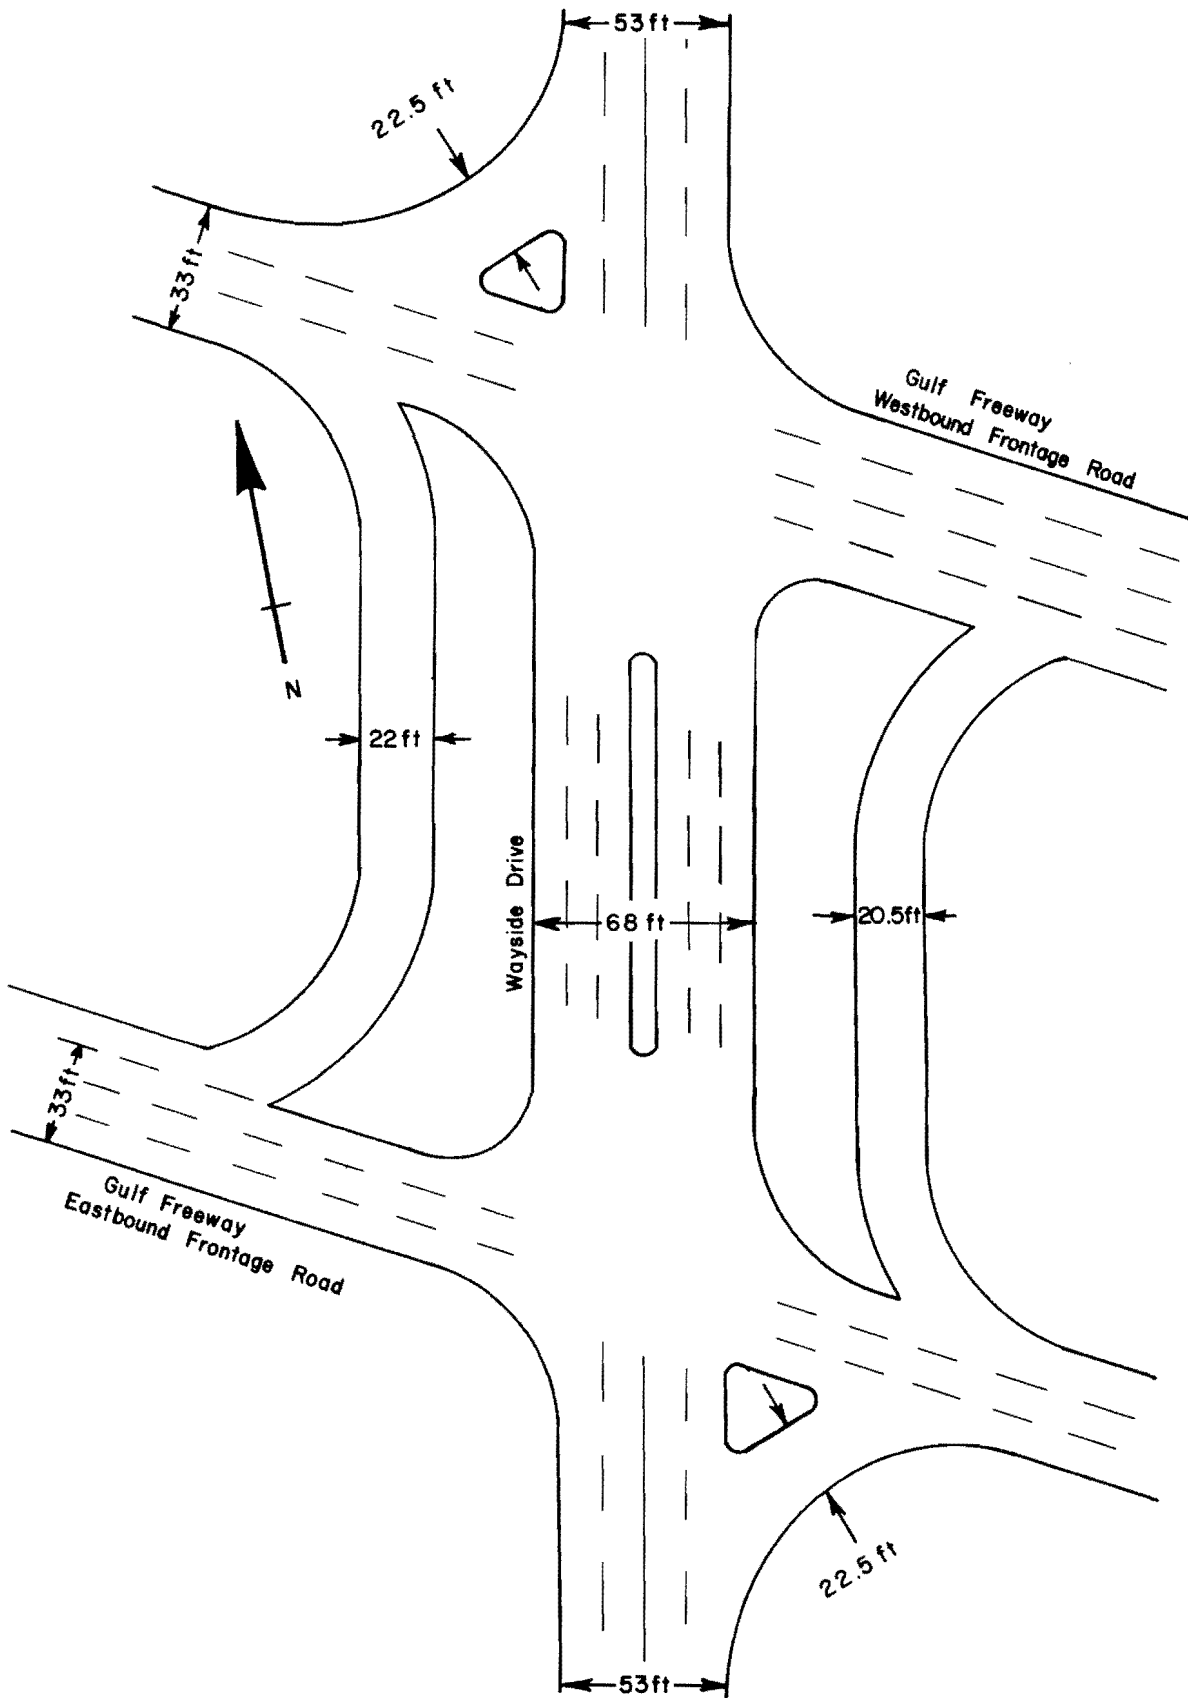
Layout of Gulf Freeway frontage roads and Wayside Drive intersection (after changes).
